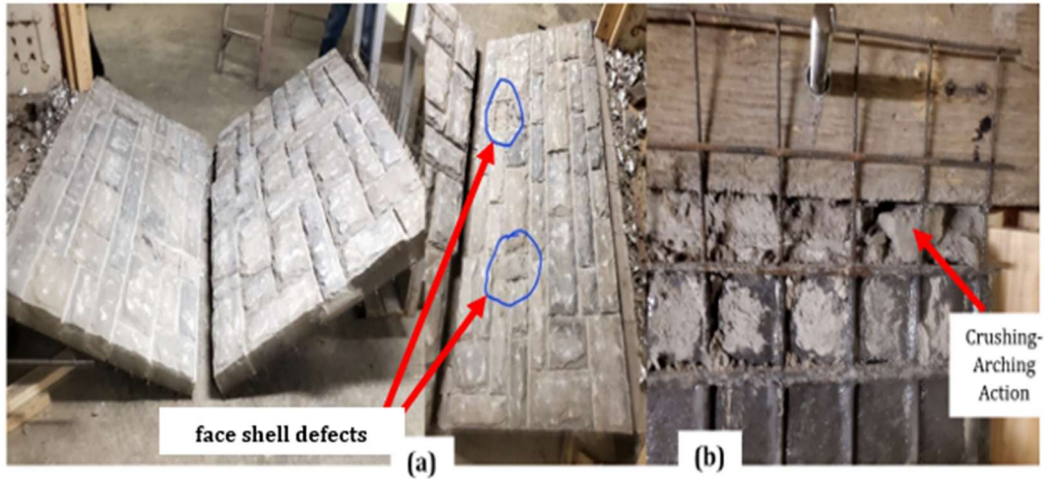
(a) The exterior surface of the stone wall has some face shell defects
